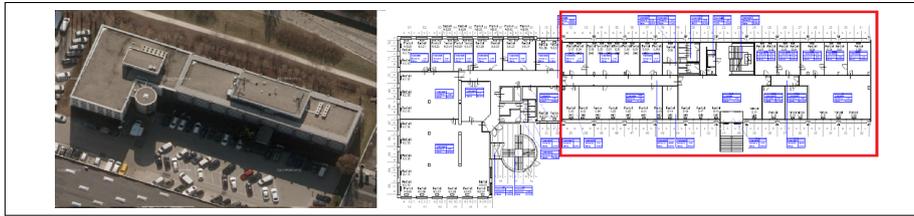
Aerial view of the building (left, ViennaGIS [9]) and a typical floor plan (right, Caverion Österreich GmbH)
